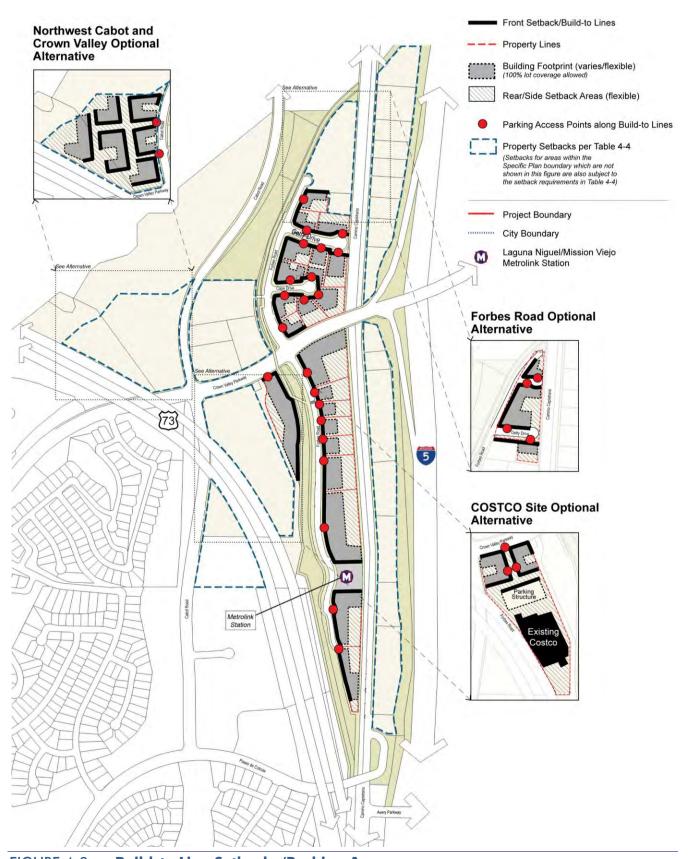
Build-to Line Setbacks/Parking Access
